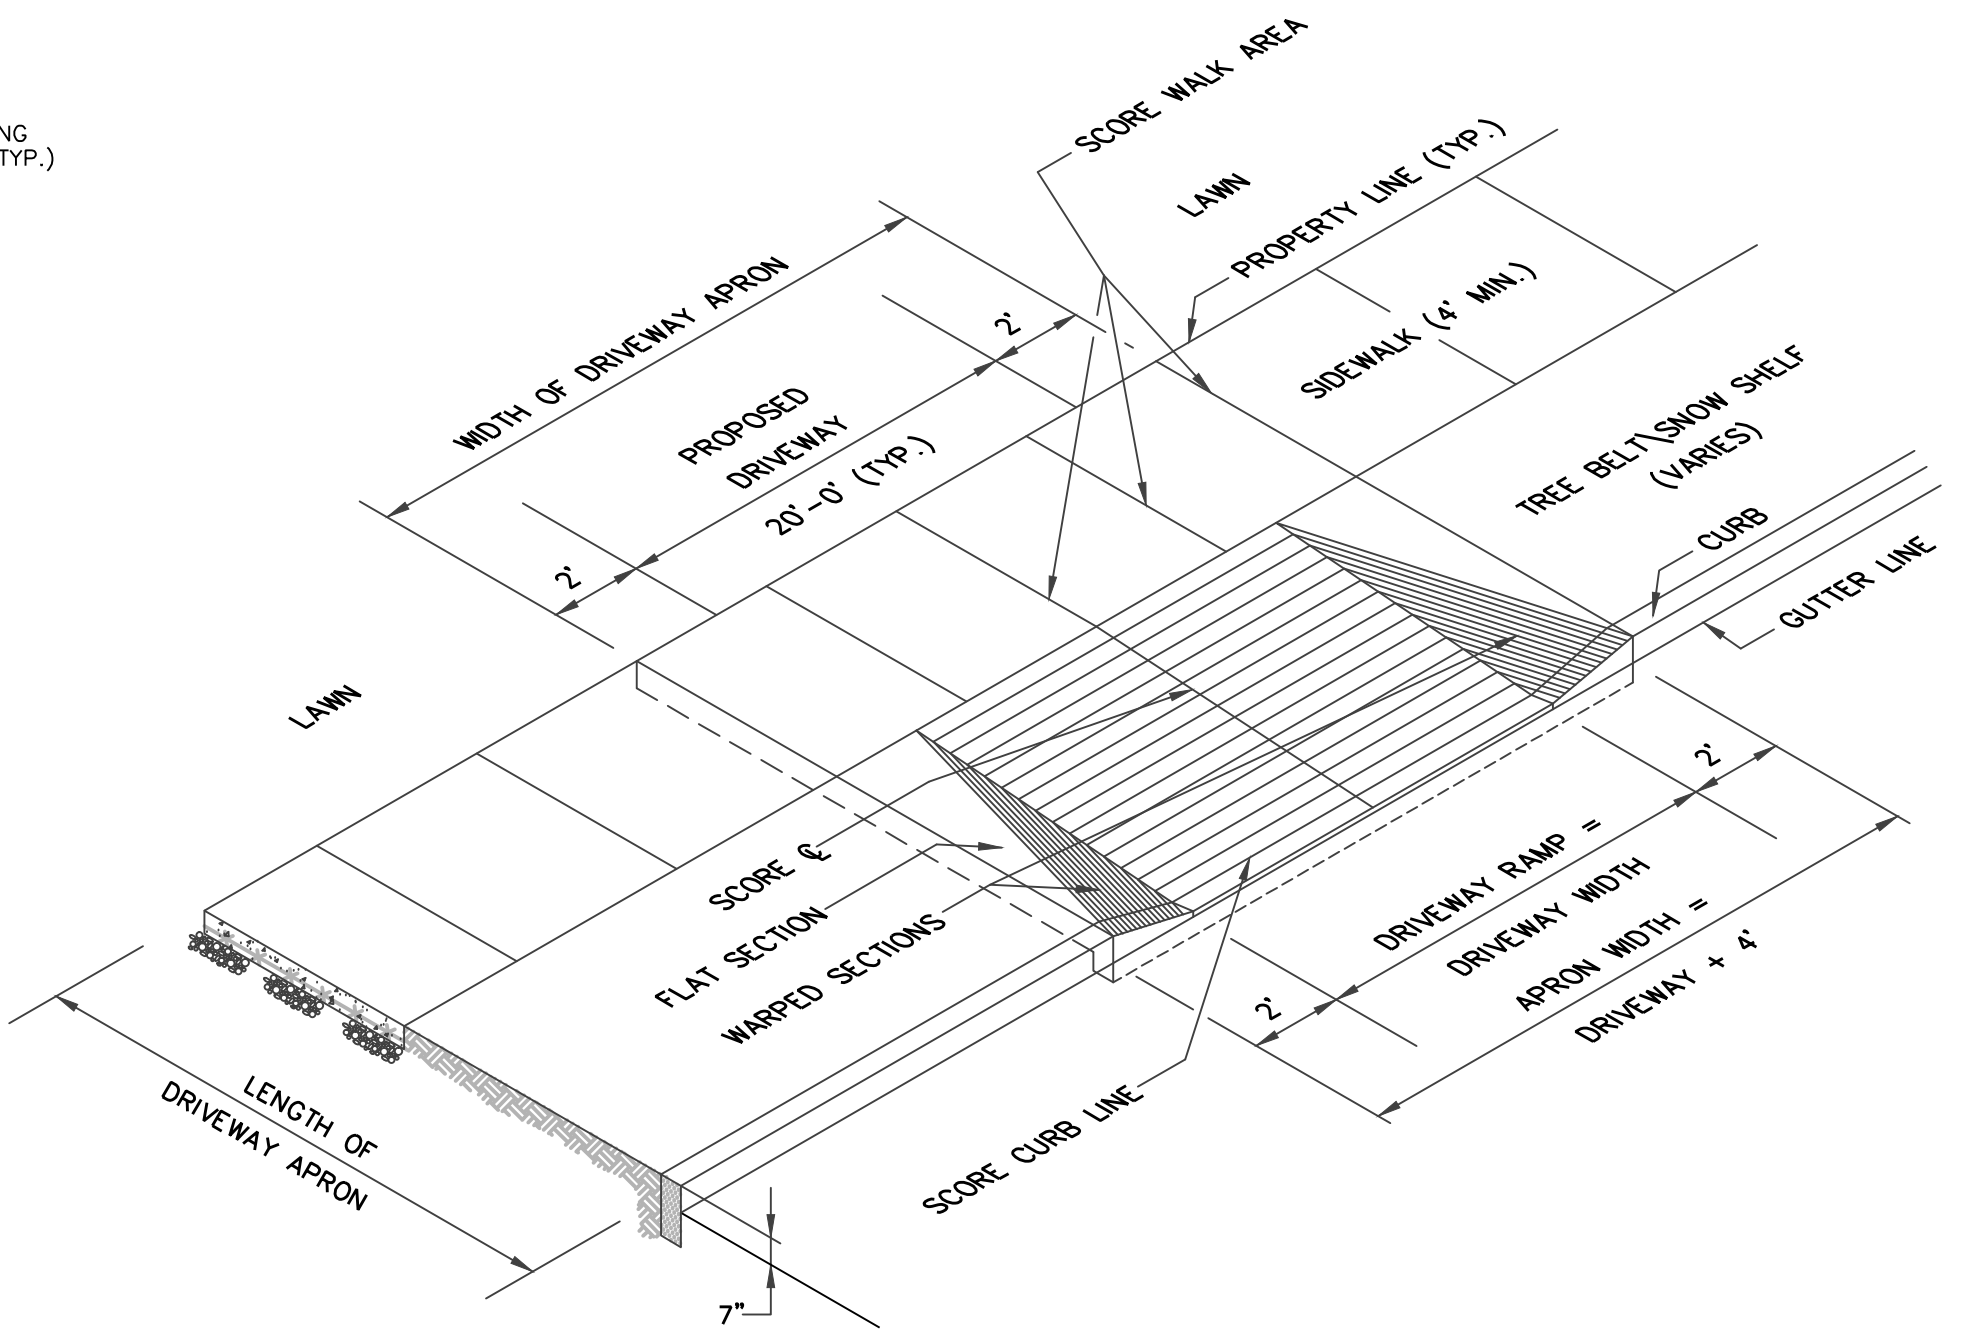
DETAILS OF CONCRETE RAMP WHERE SIDEWALK ADJOINS CURBING
